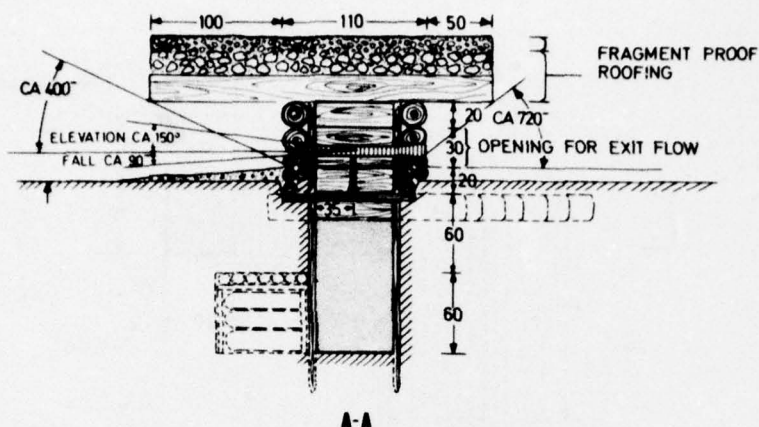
Side view of the 84mm RCR Carl Gustaf bunker
